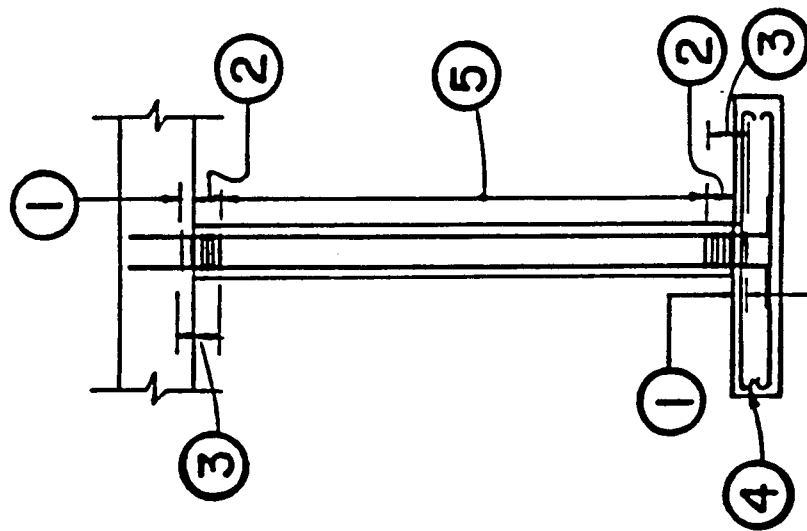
North Carolina Unequal Column Height Bent Details - Cross Sections
